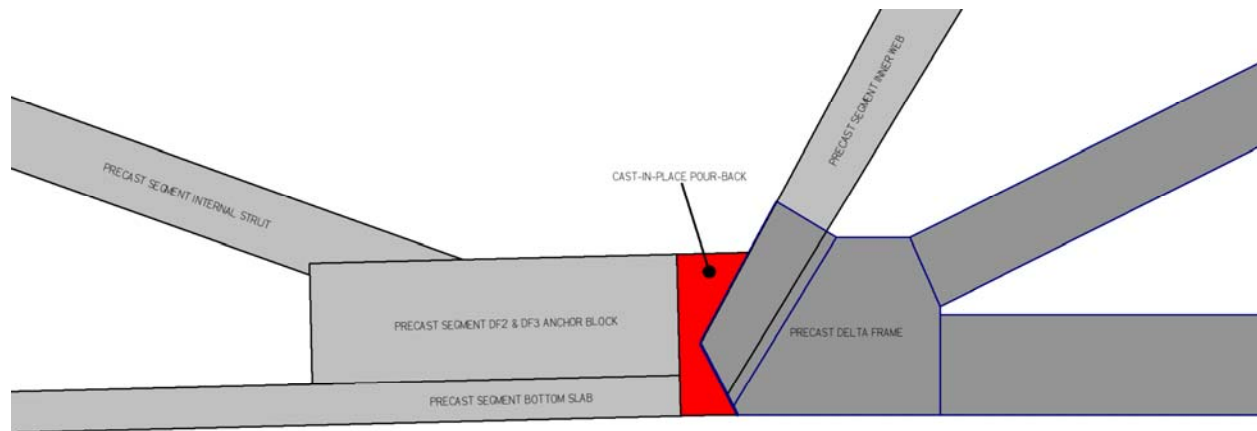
Delta Frame – To- Box Girder Connection (NB Shown, SB Similar)
